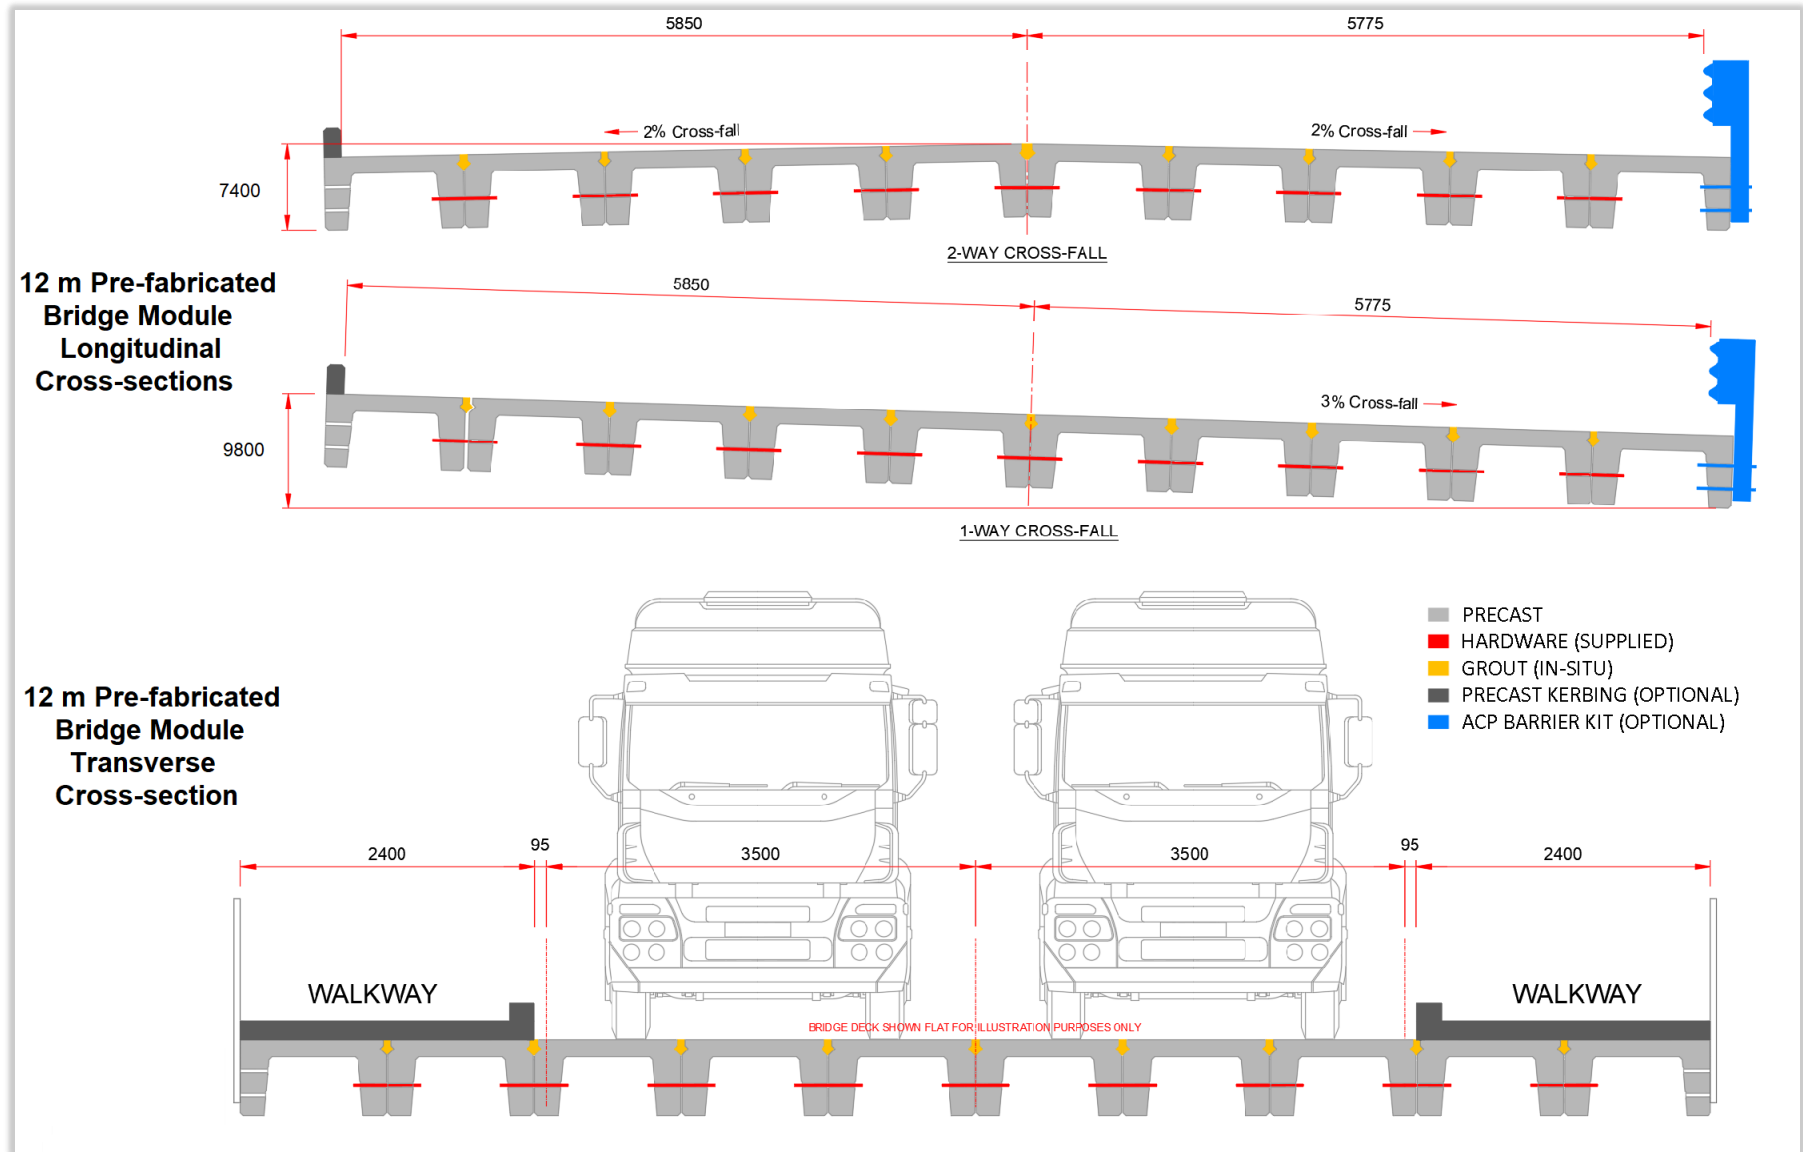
Example of a Prefabricated Bridge 12 m Module Cross-sections
